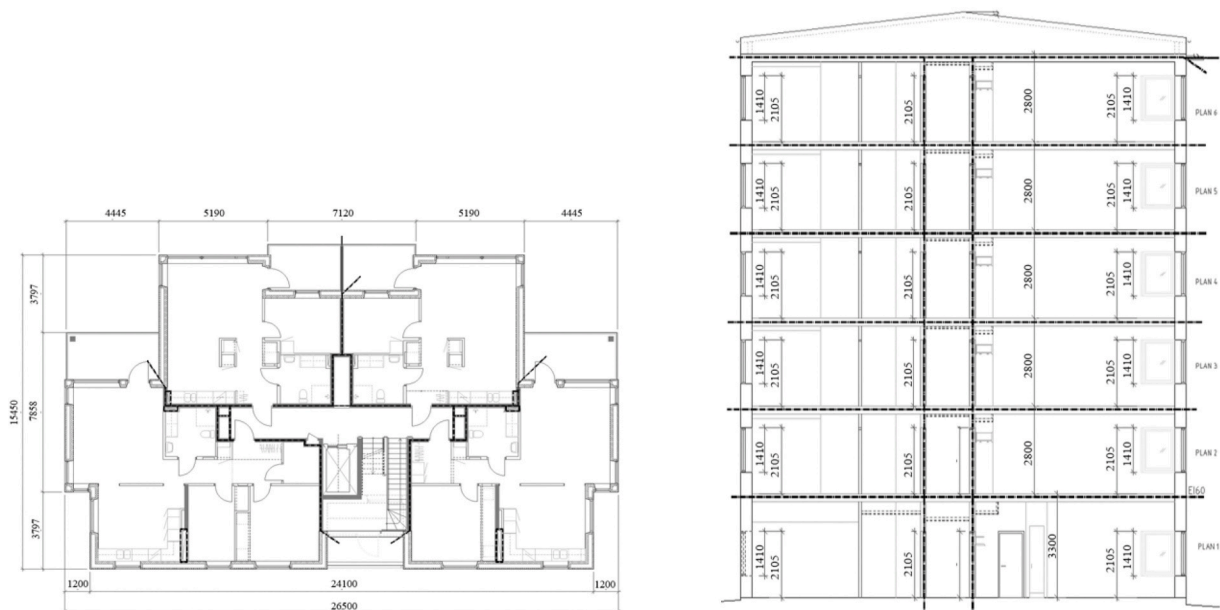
Floor plan (left) and section (right) of the reference prefabricated concrete building.
